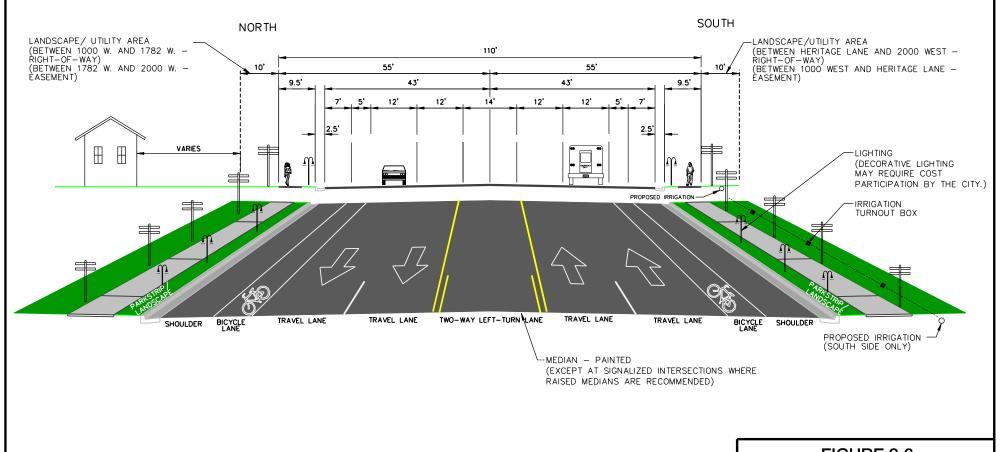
ALTERNATIVE C TYPICAL SECTION
